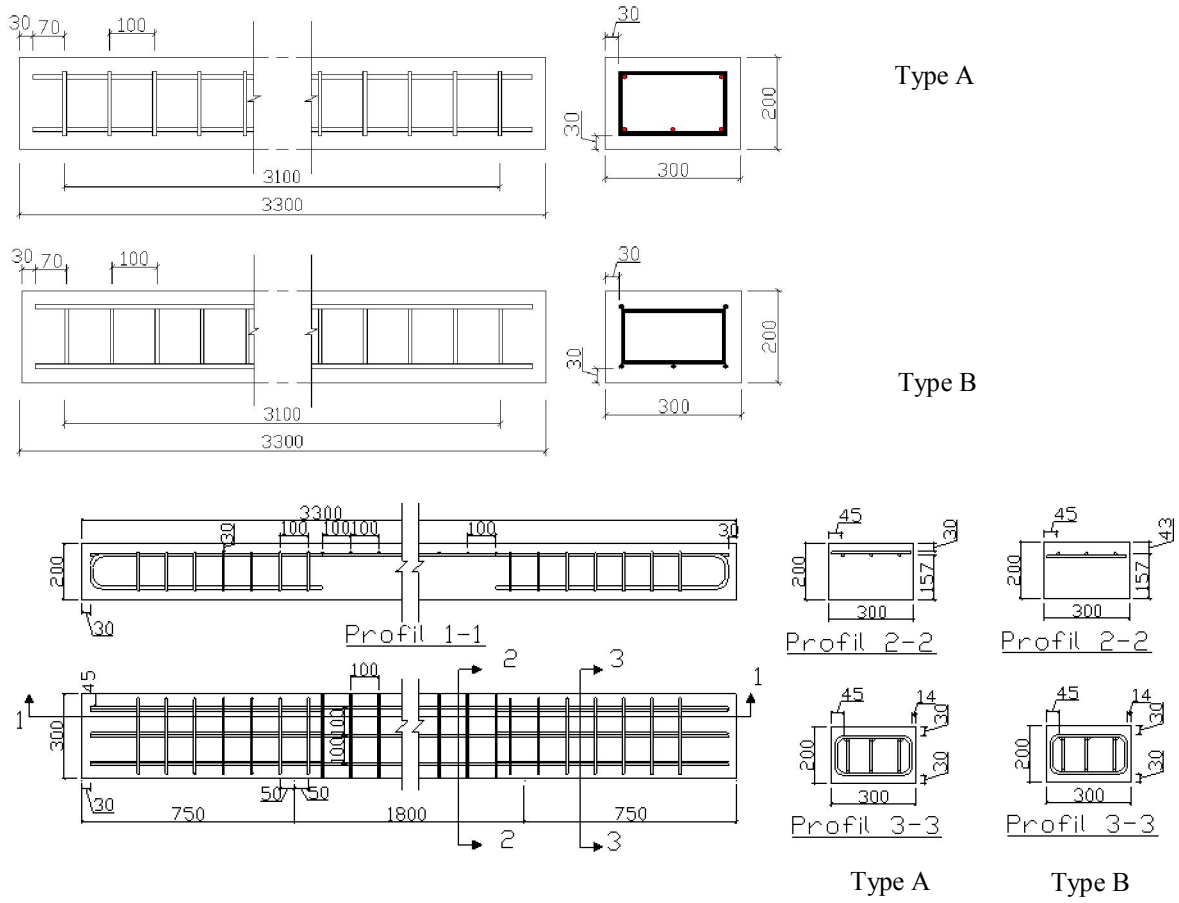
Geometry and steel plan of test specimens in Series 3 (TR-position)
